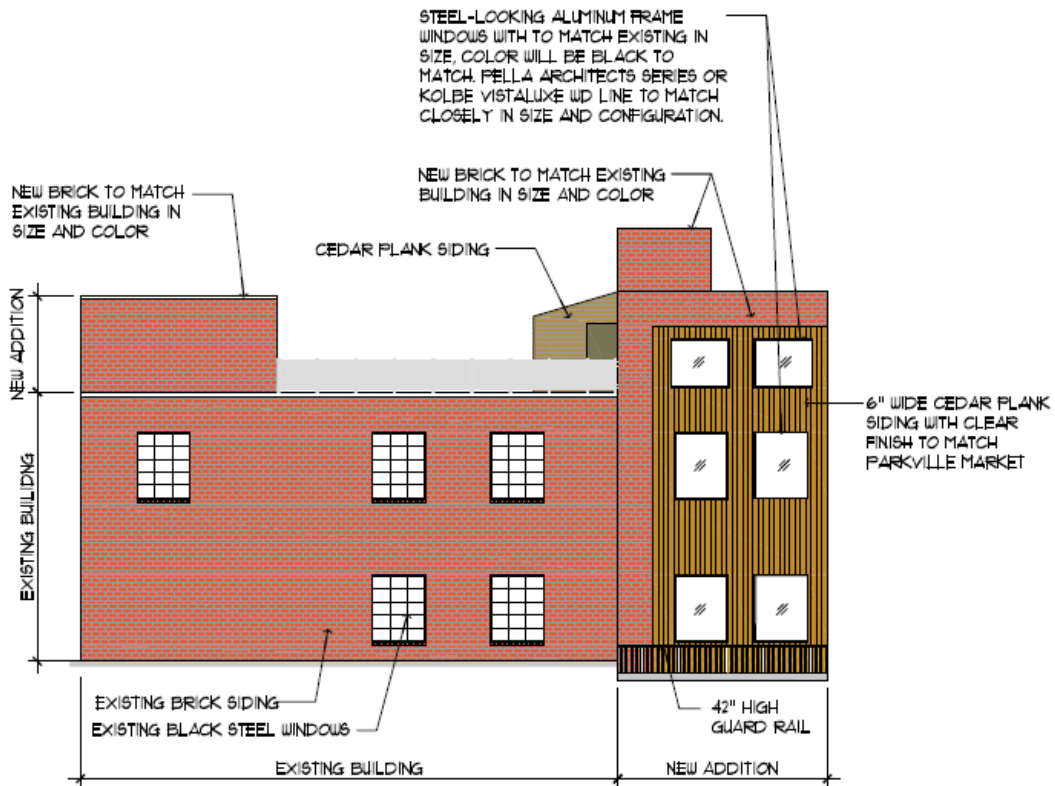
North façade of the existing building w/ proposed addition – Lifecare Design 2022
